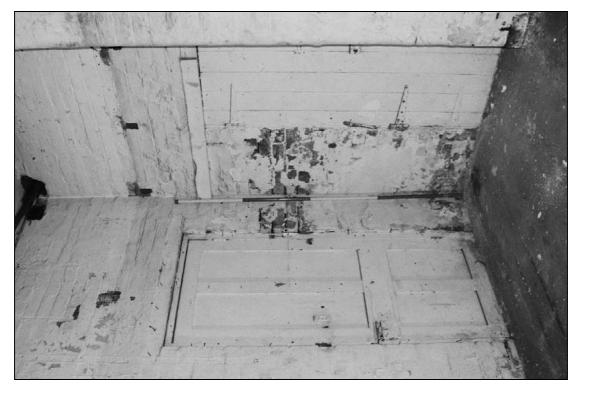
Detail of doorways, northeast corner of G19, south range – left door is primary leading to G8 (east range) right door is inserted (film 21.27)
